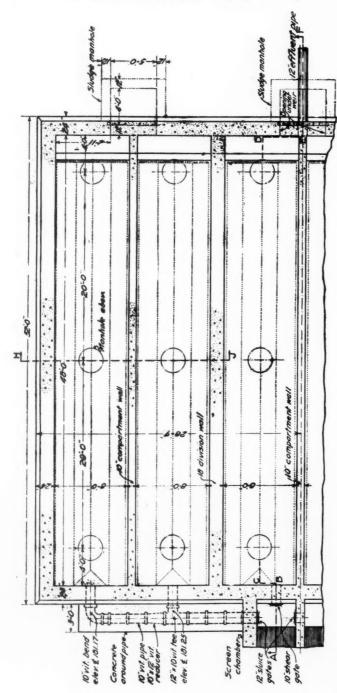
GENERAL PLAN OF ONE-HALF OF MAIN SETTLING TANK.
